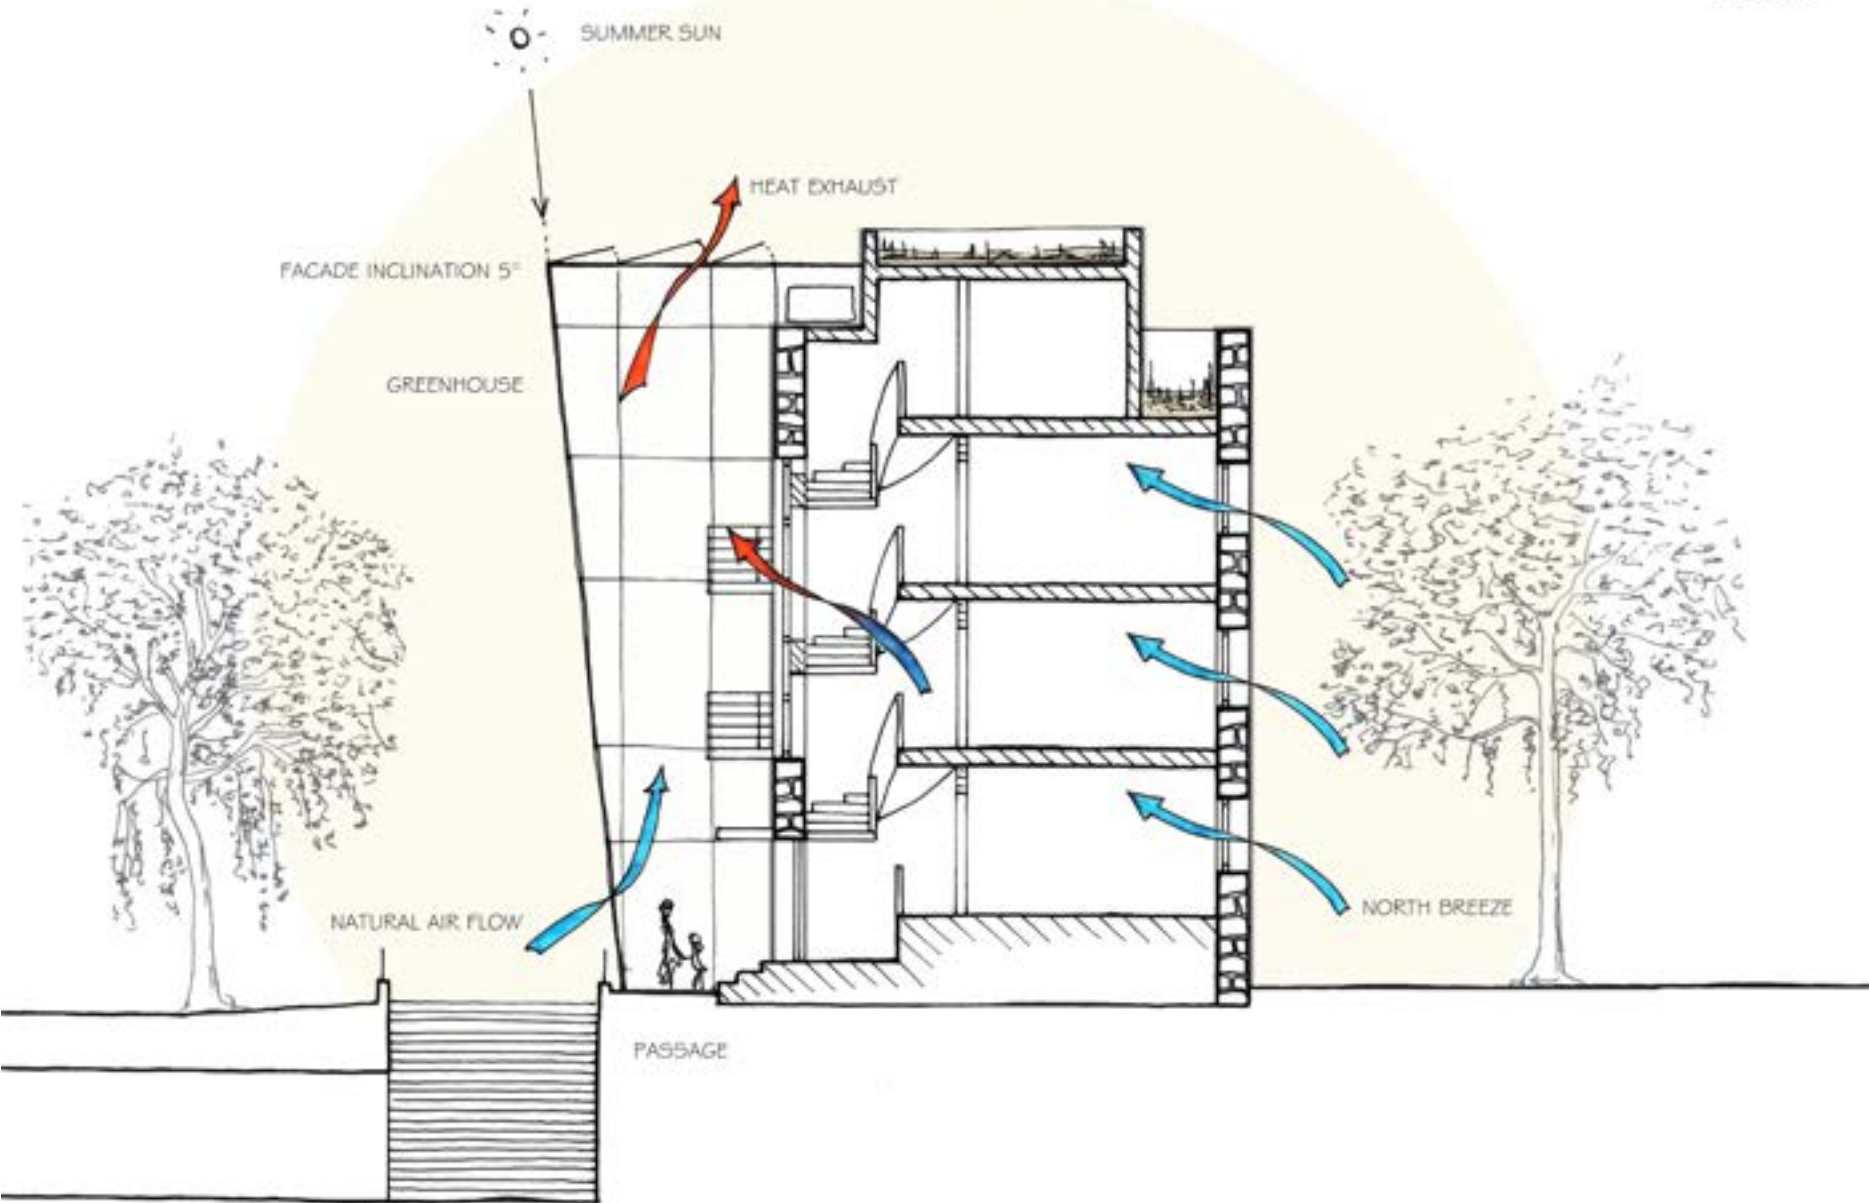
Author (2022). Section of the first building of Prosfygika - Reduce (greenhouse, summer) [Sketch].
